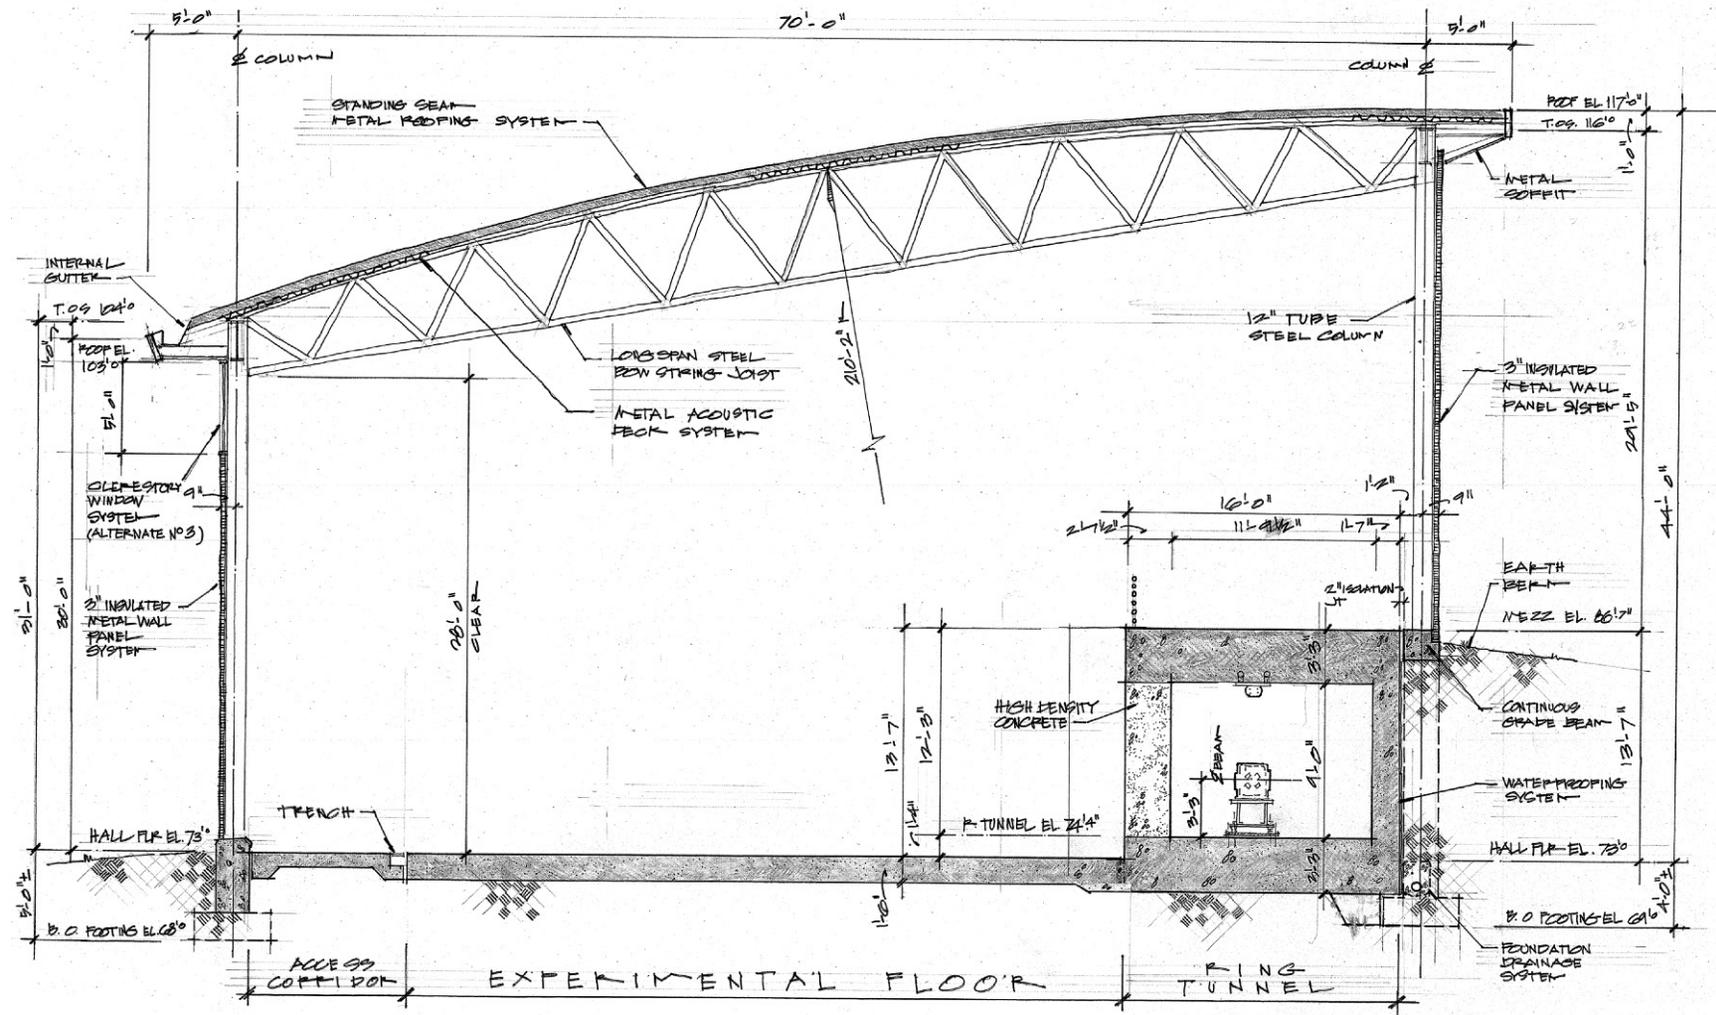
Cross-section through Ring Building in-between LOBs and MERs.
